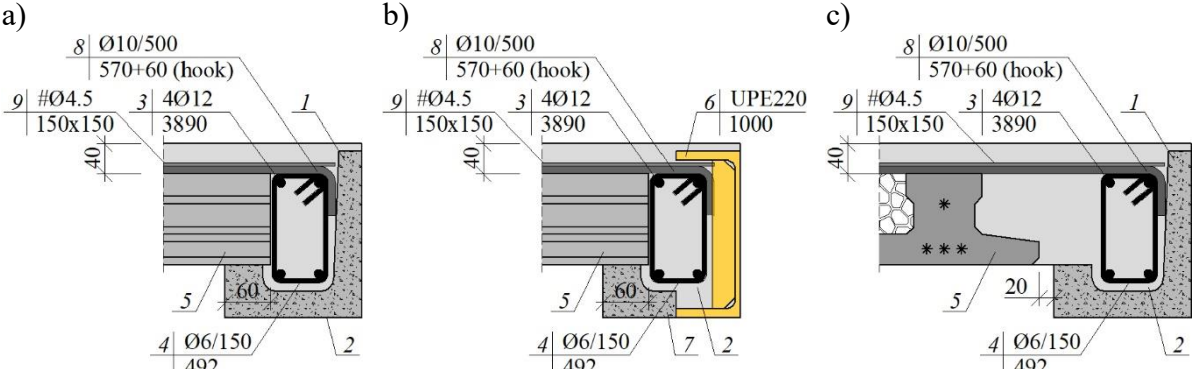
Structural details of the slab support on the top ring beam: a) supporting the panels on the L – shaped element, b) cross-section through UPE220 steel element, c) cross-section through a precast slab panel with visible assembly tolerance: 1 – precast L-shaped element, 2 – concrete, 3 – main reinforcement, 4 – stirrups, 5 – precast panel, 6 – C-section steel element, 7 – cut L-shaped element, 8 – steel hook (upper reinforcement), 9 – steel mesh 15x15 cm with a diameter of 4 mm
